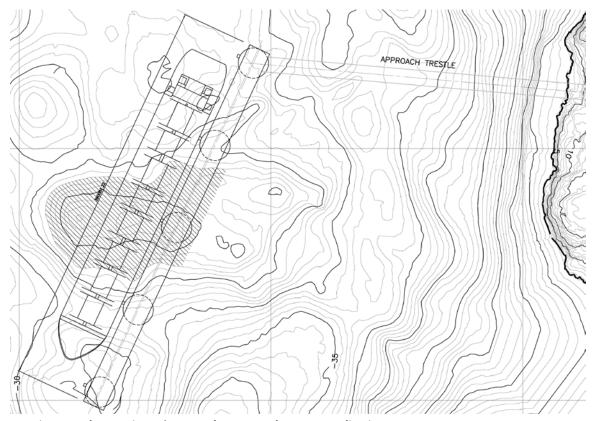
Plan, Option 1 for Steensby Ore Dock (see Appendix A)
